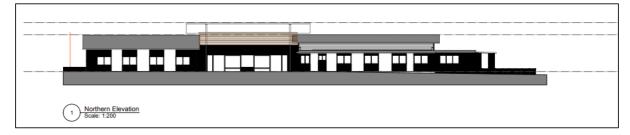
| Northern elevation of the Stage 1 built form (Source: Applicant's RtS 2020)
